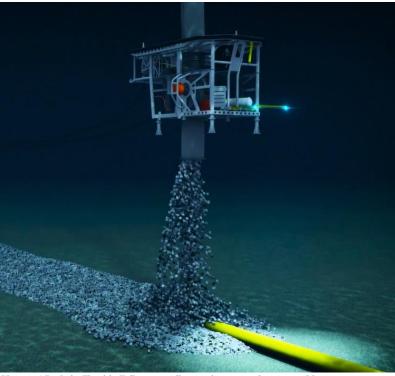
Boskalis Flexible Fallpipe installing rock over a submarine cable
